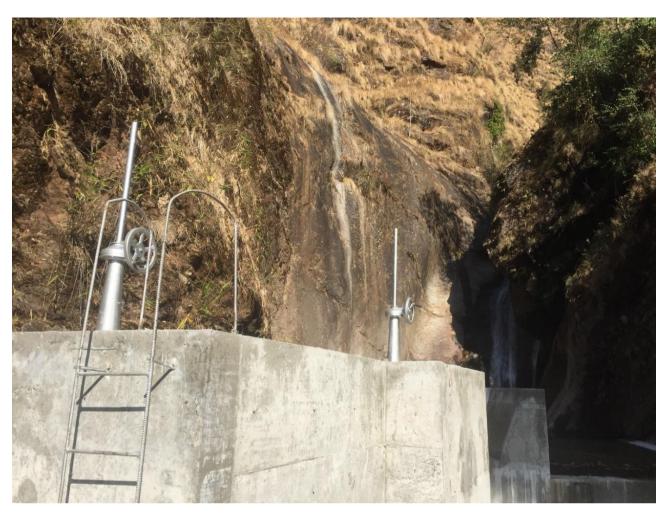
Gate and Manual Screw Spindle Hoist Installed at Siuri Intake Box Culvert
